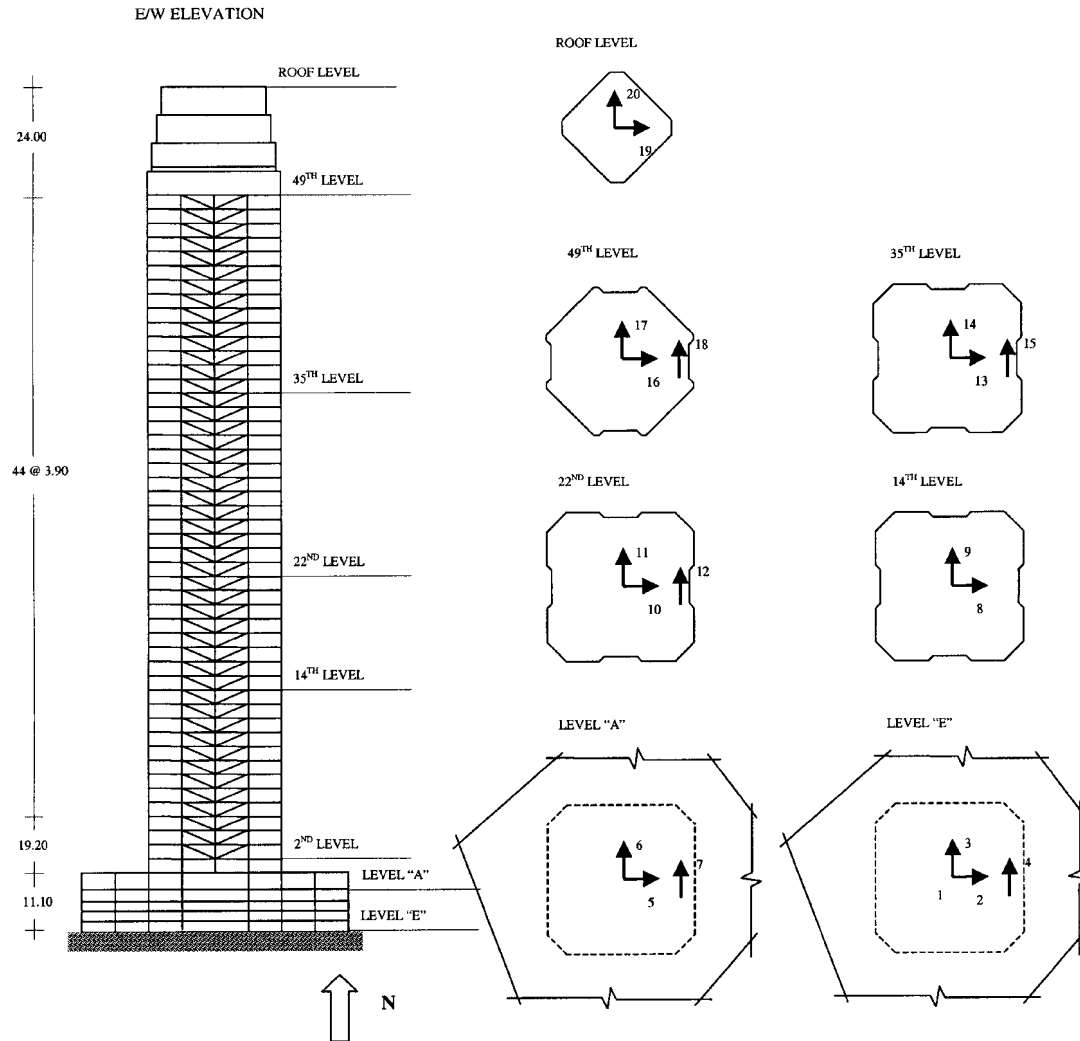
Location of the sensors in Los Angeles 52-storey office building
